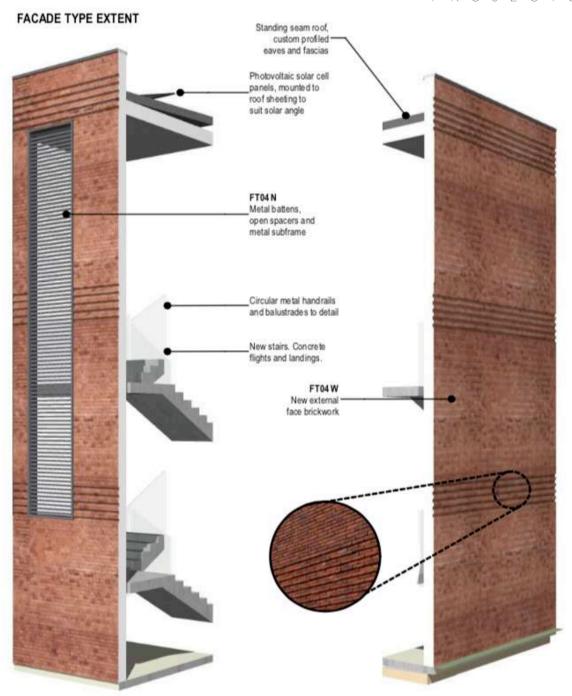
Building D Façade north and west (Source: FJMT, DA-5903, 18.12.19)
